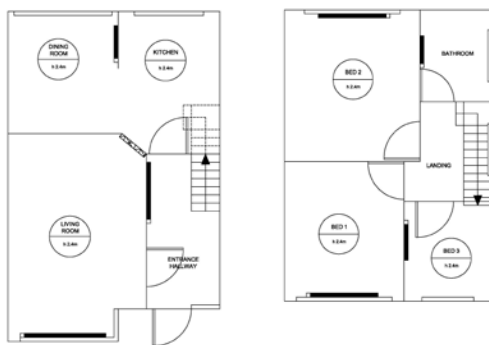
Floorplans of groundfloor (left) and first floor (right) with radiator positioning (in black blocks)
